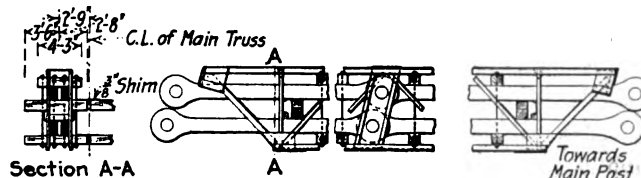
PANEL OF TOP-CHORD EYE-BARS AND SUPPORTING TRUSS
